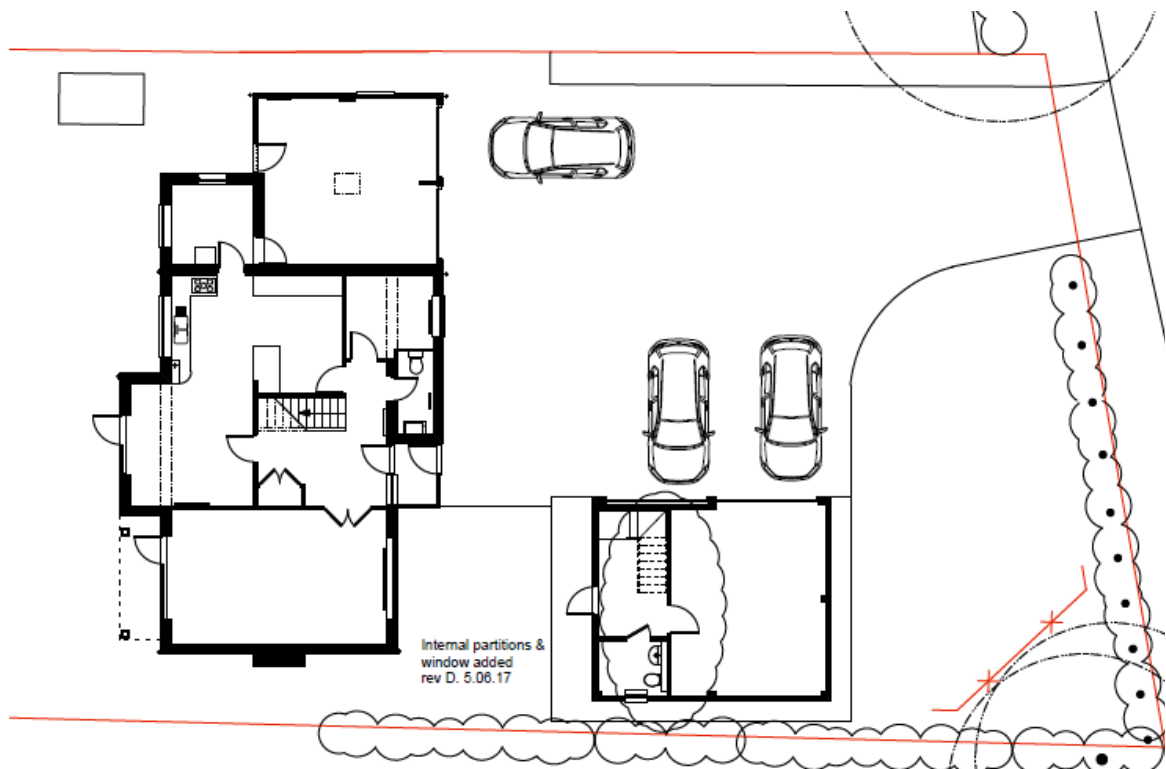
Latest approved site plan for garage building (17/01646/HOUSE)
